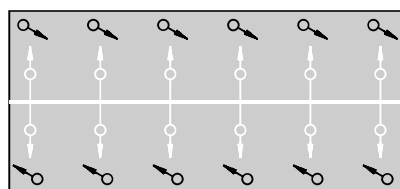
Outlines a typical requirement. Schematic layout of humidifiers in wood-working plant where exhaust fans are used. Arrows indicate air flow induced by fans. Humidifiers are sized for load conditions imposed by fan. Humidifiers are located to give uniform distribution of humidity when fans are off or when fans are running.
